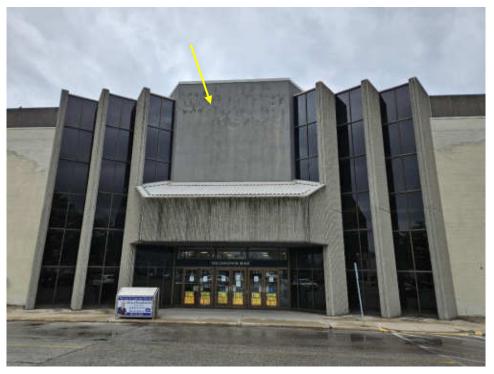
EIFS Installed Outboard of Stone Aggregate Wall at Main Entrances
